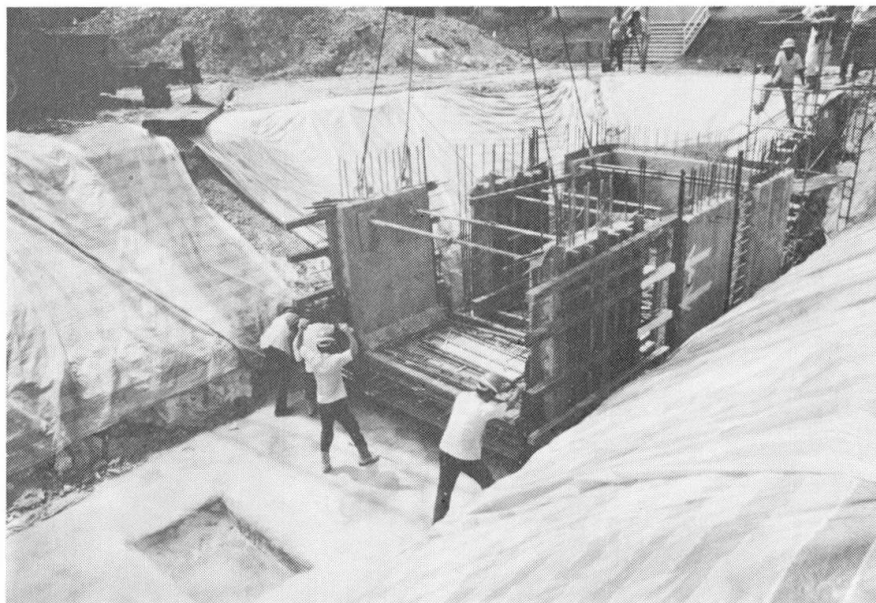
Precast segments being placed on a prepared bed on the open cut at certain spacing,
